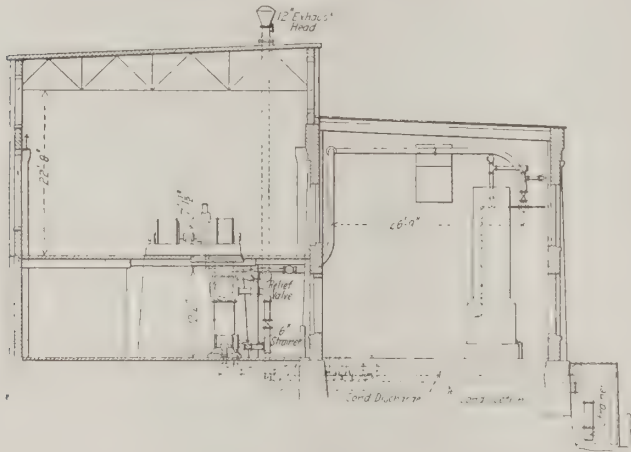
ELEVATION OF PLANT OF SALMON FALLS MFG. CO.
